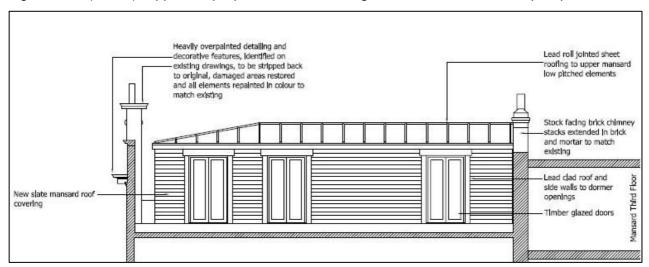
(above): Now proposed detailed design of mansard behind the parapet.
